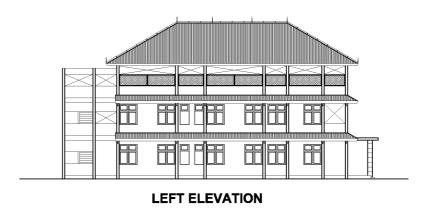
View of Jroh Naguna Orphanage Vocational Training Building
